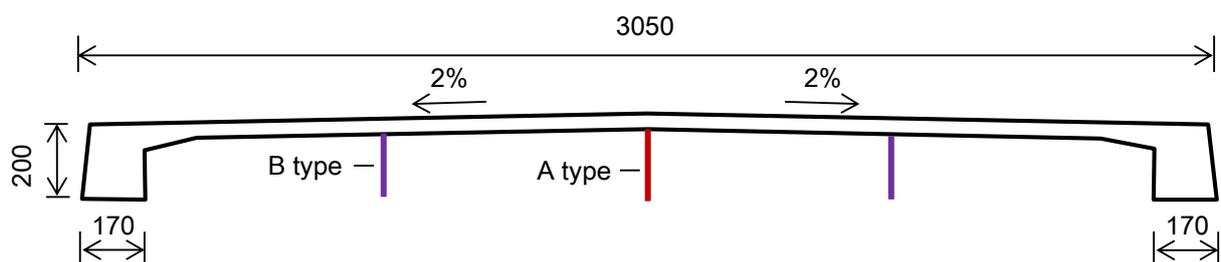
Girder shape and the locations of two stabilizer types (cm).
